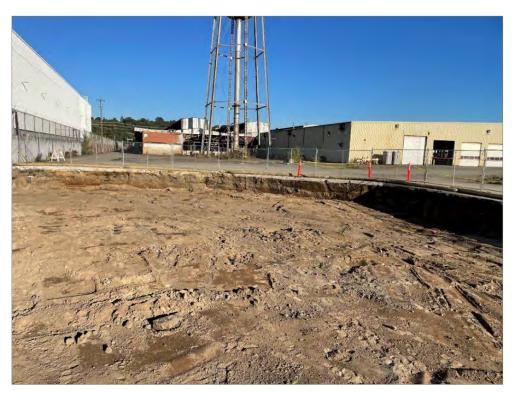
Area 1 – Final Extent of Southeast Corner. Photo taken on September 21, 2021. View direction is east.
